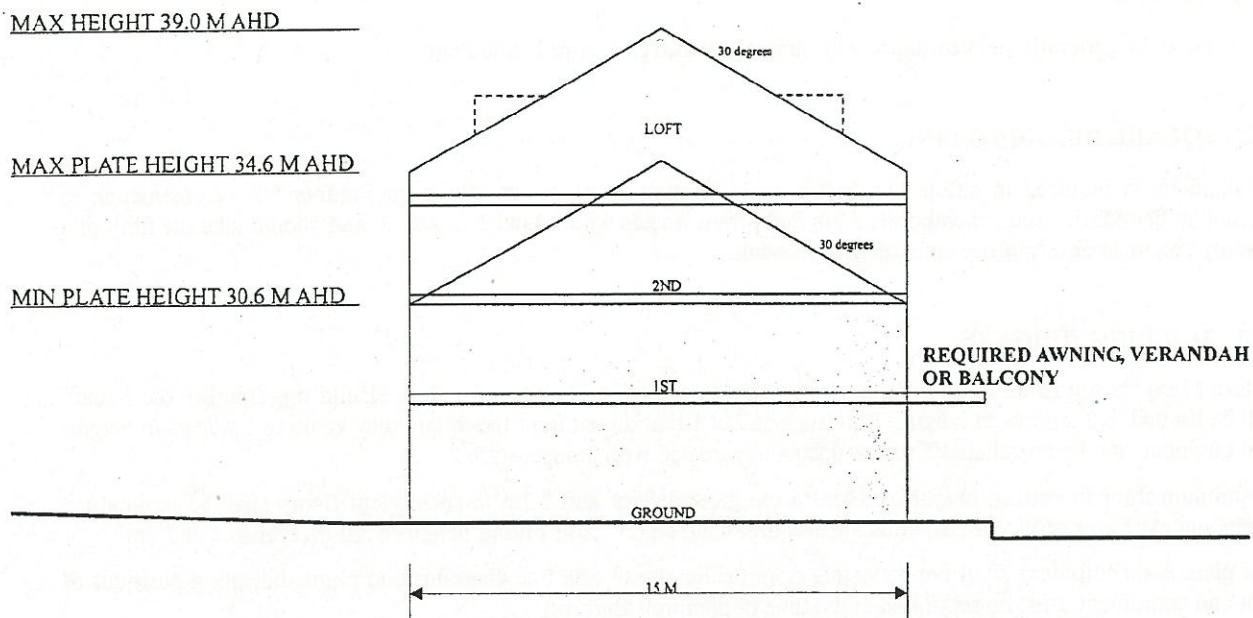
Lot 1 - Southern Boundary - Permissible Building Section
